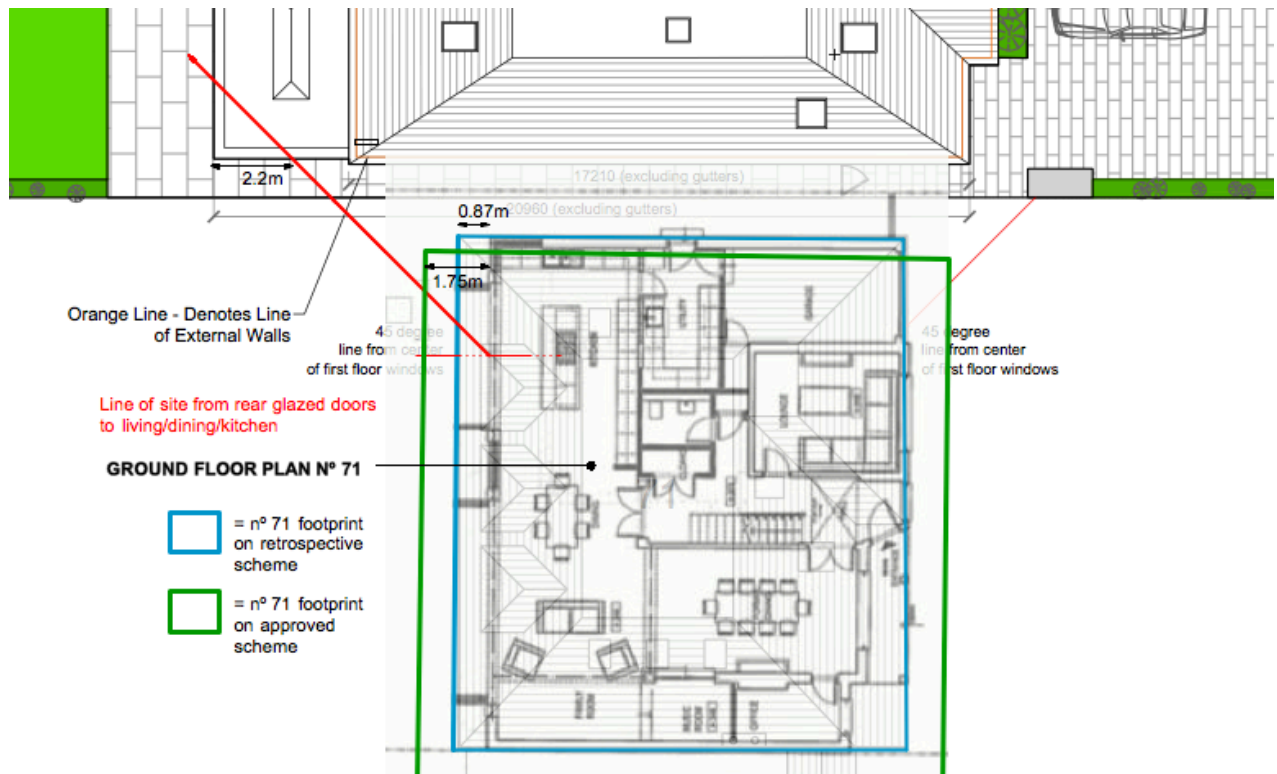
Marked up extract planning application plan 73PG-11 rev “J”
